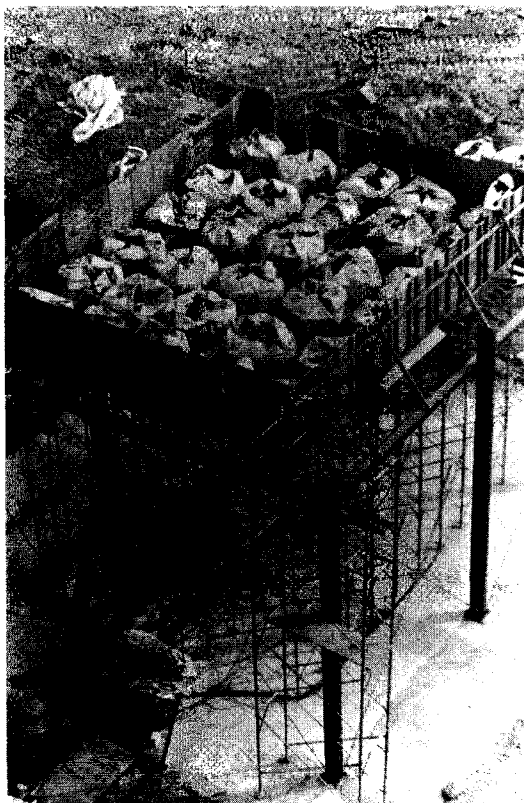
Distributions of Sand Bags Placed on Scaffold Frame Shoring in Load Path Tests
